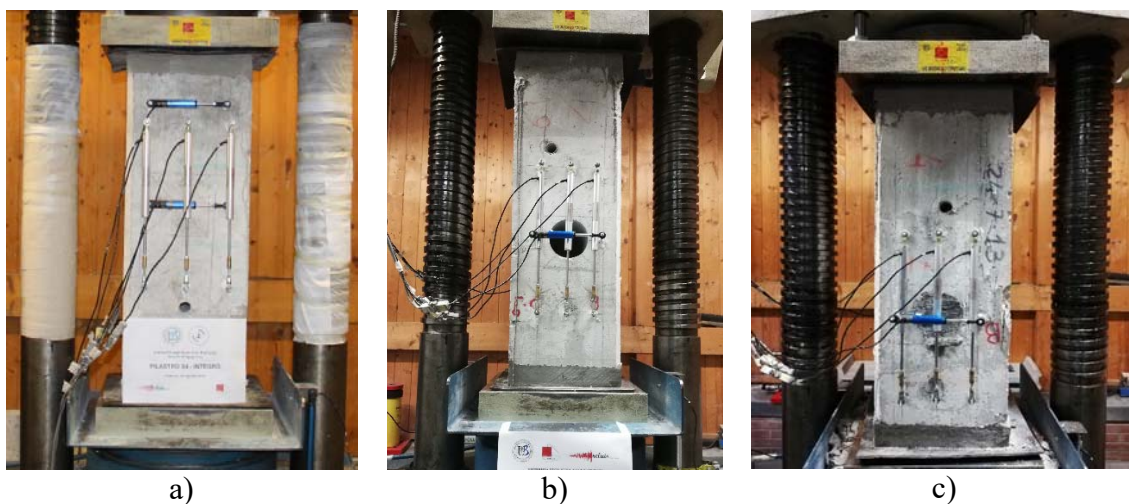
a) as-built b) drilled and c) drilled-restored specimens before testing.
